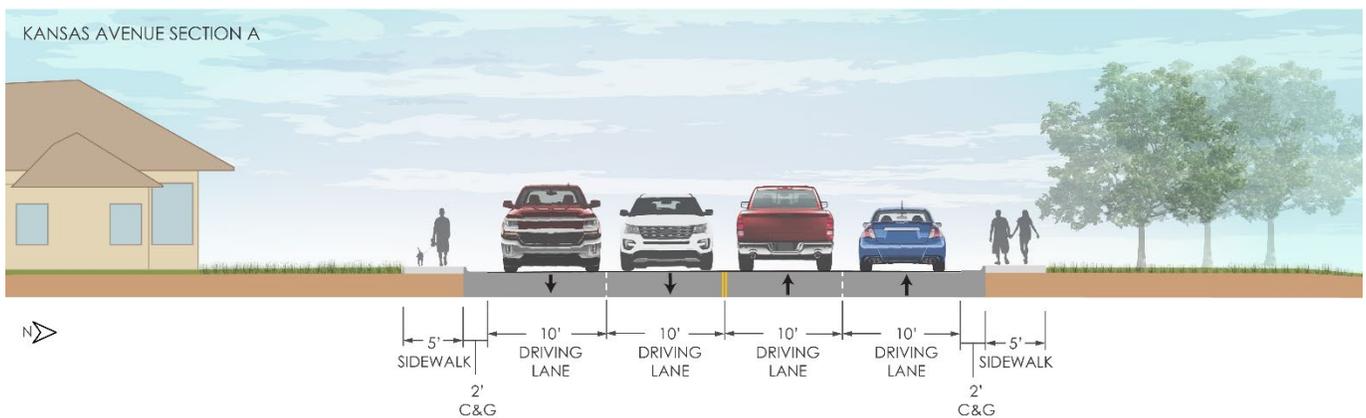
Kansas Avenue Section A - Typical Roadway Section
